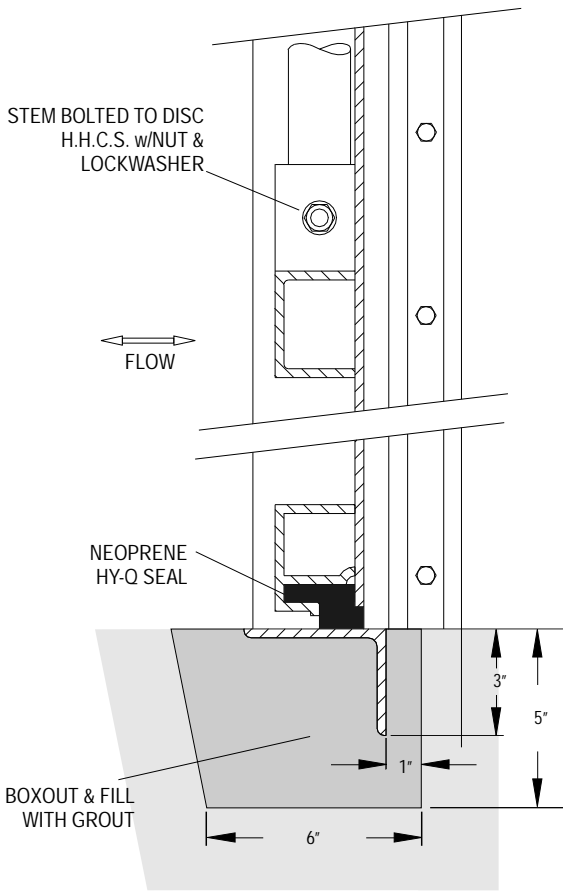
721- Aluminum Embedded Frame In-Channel Mounting with HY-Q Seal; Section BB
